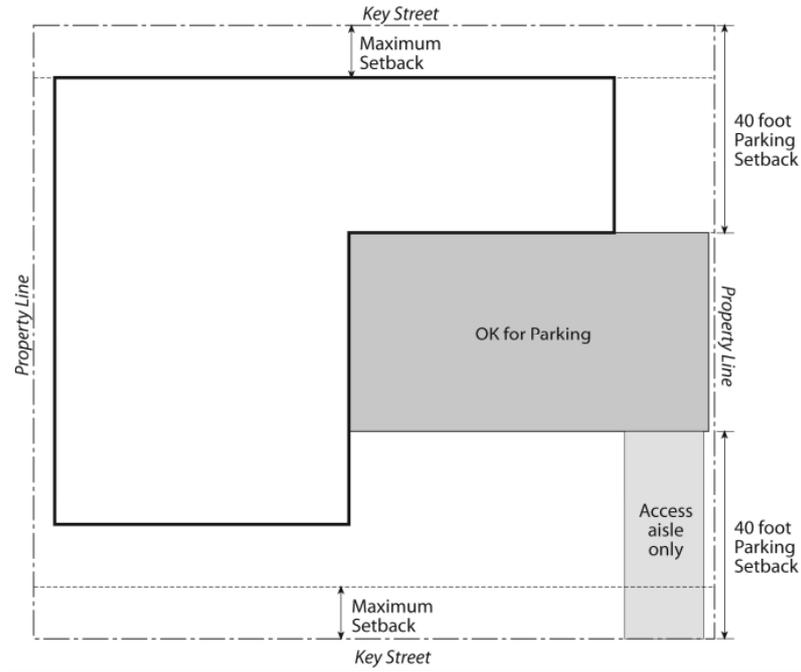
Building facade placements on lots greater than 100 feet
